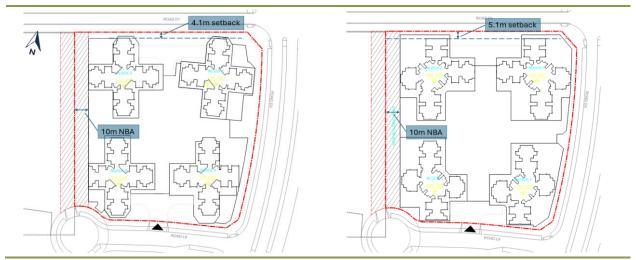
Master Layout Plan of Base Scheme (left) and Proposed Scheme (right) of Area 117
